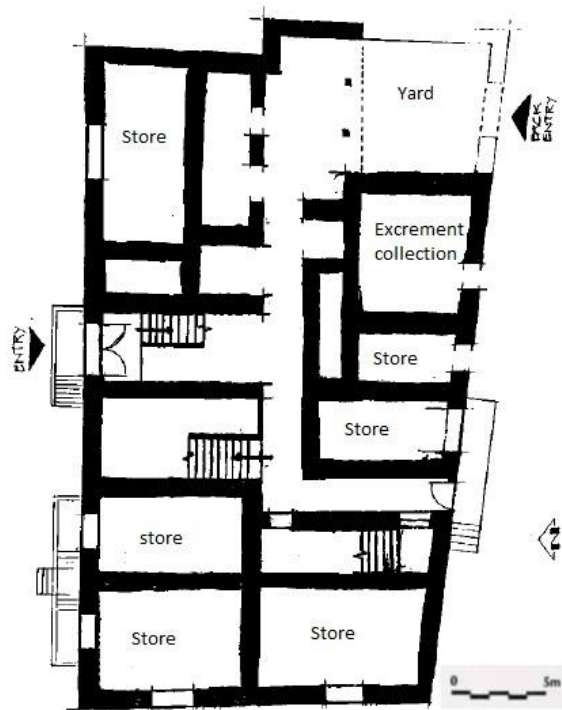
Bamansur House (First Floor) Mukalla (Al-Maashi, 1998)
